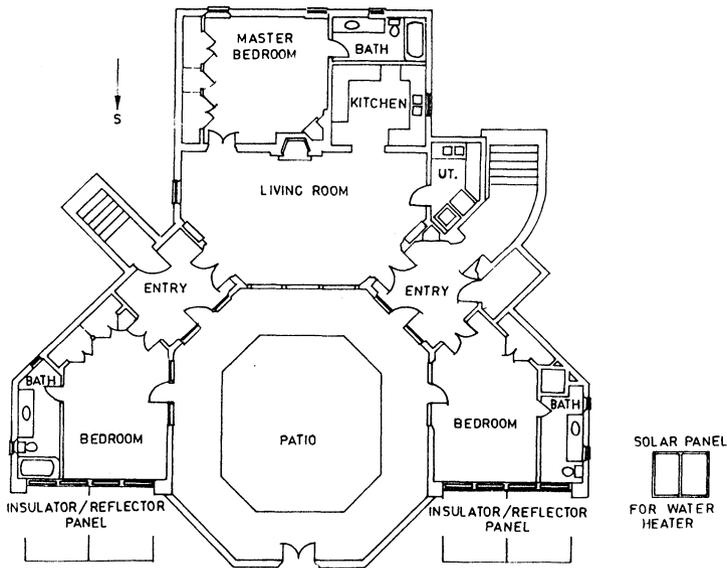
FLOOR-PLAN OF GUNDERSON HOUSE (From SANDIA[29])
